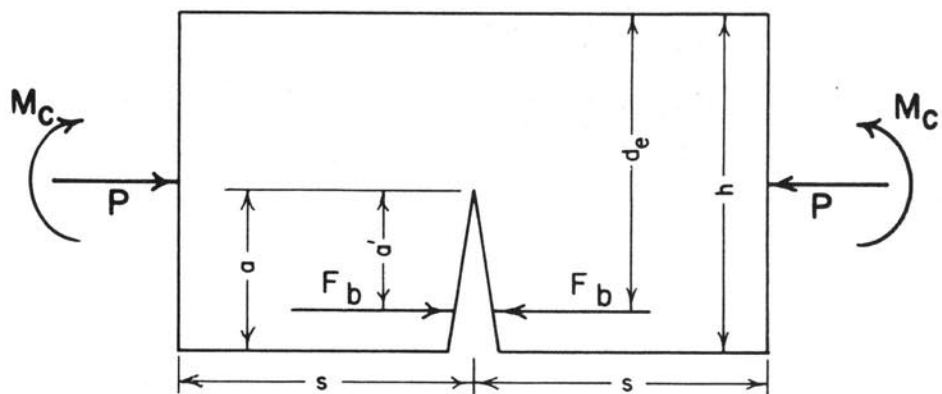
CRACKED CONCRETE ELEMENT FROM REINFORCED CONCRETE BODY
